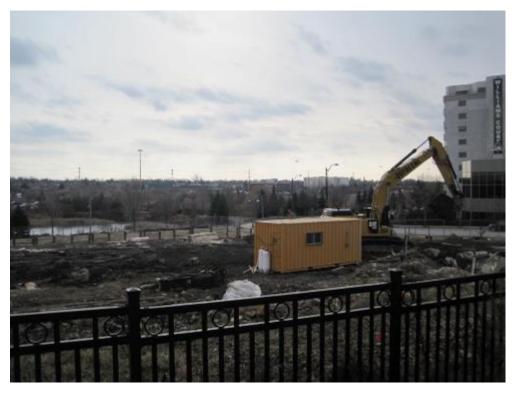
View of excavated land and active construction adjacent to Maritime Way, looking south (Figure 3-6).
